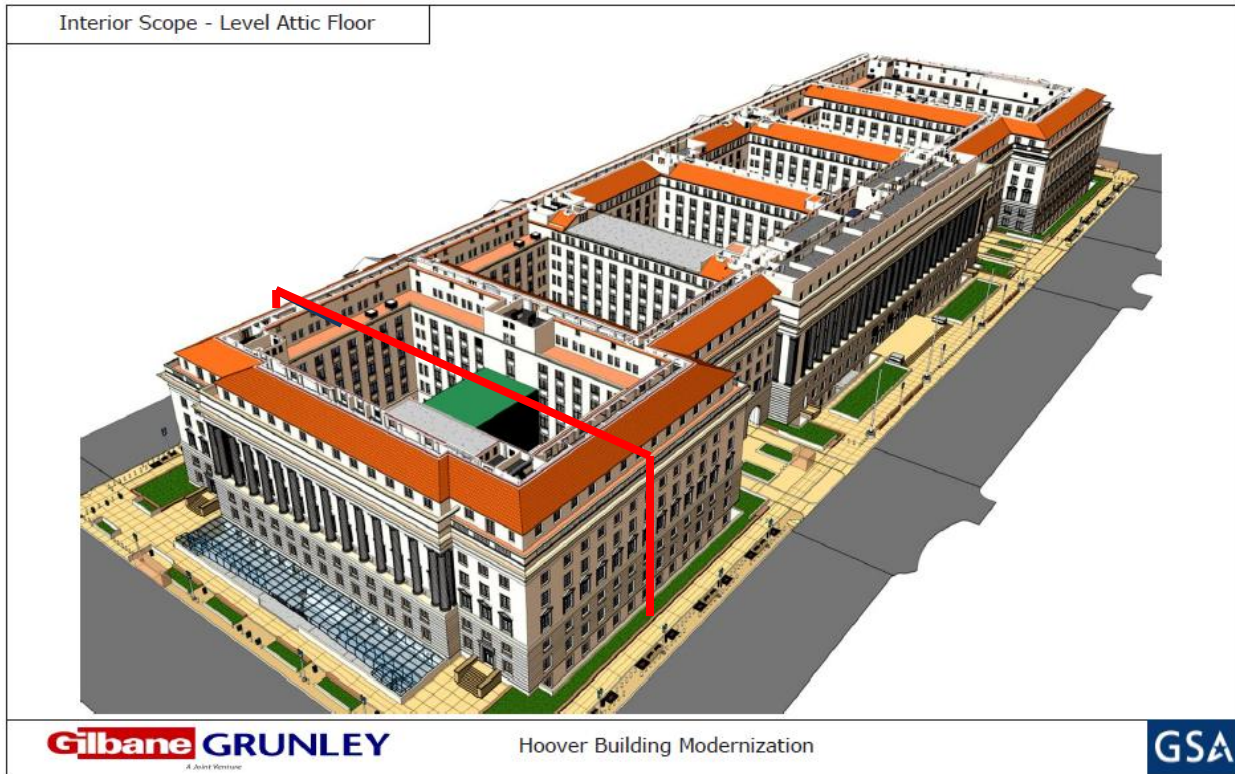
Rendering of the Office Renovation Building, the red line illustrates the phase line between current construction zone (left) and the occupied spaces of the building (right)
